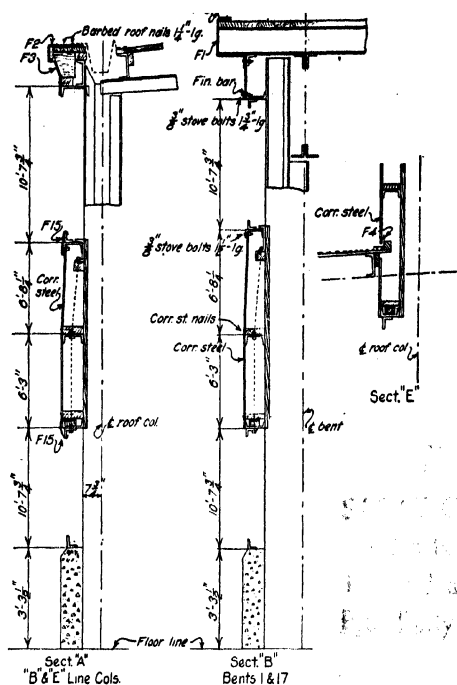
Corrugated steel details for machine shop shown in Fig. 124.
